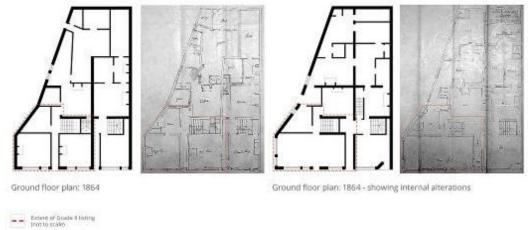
existing and proposed layout of Earl de Grey Public House c. 1864
